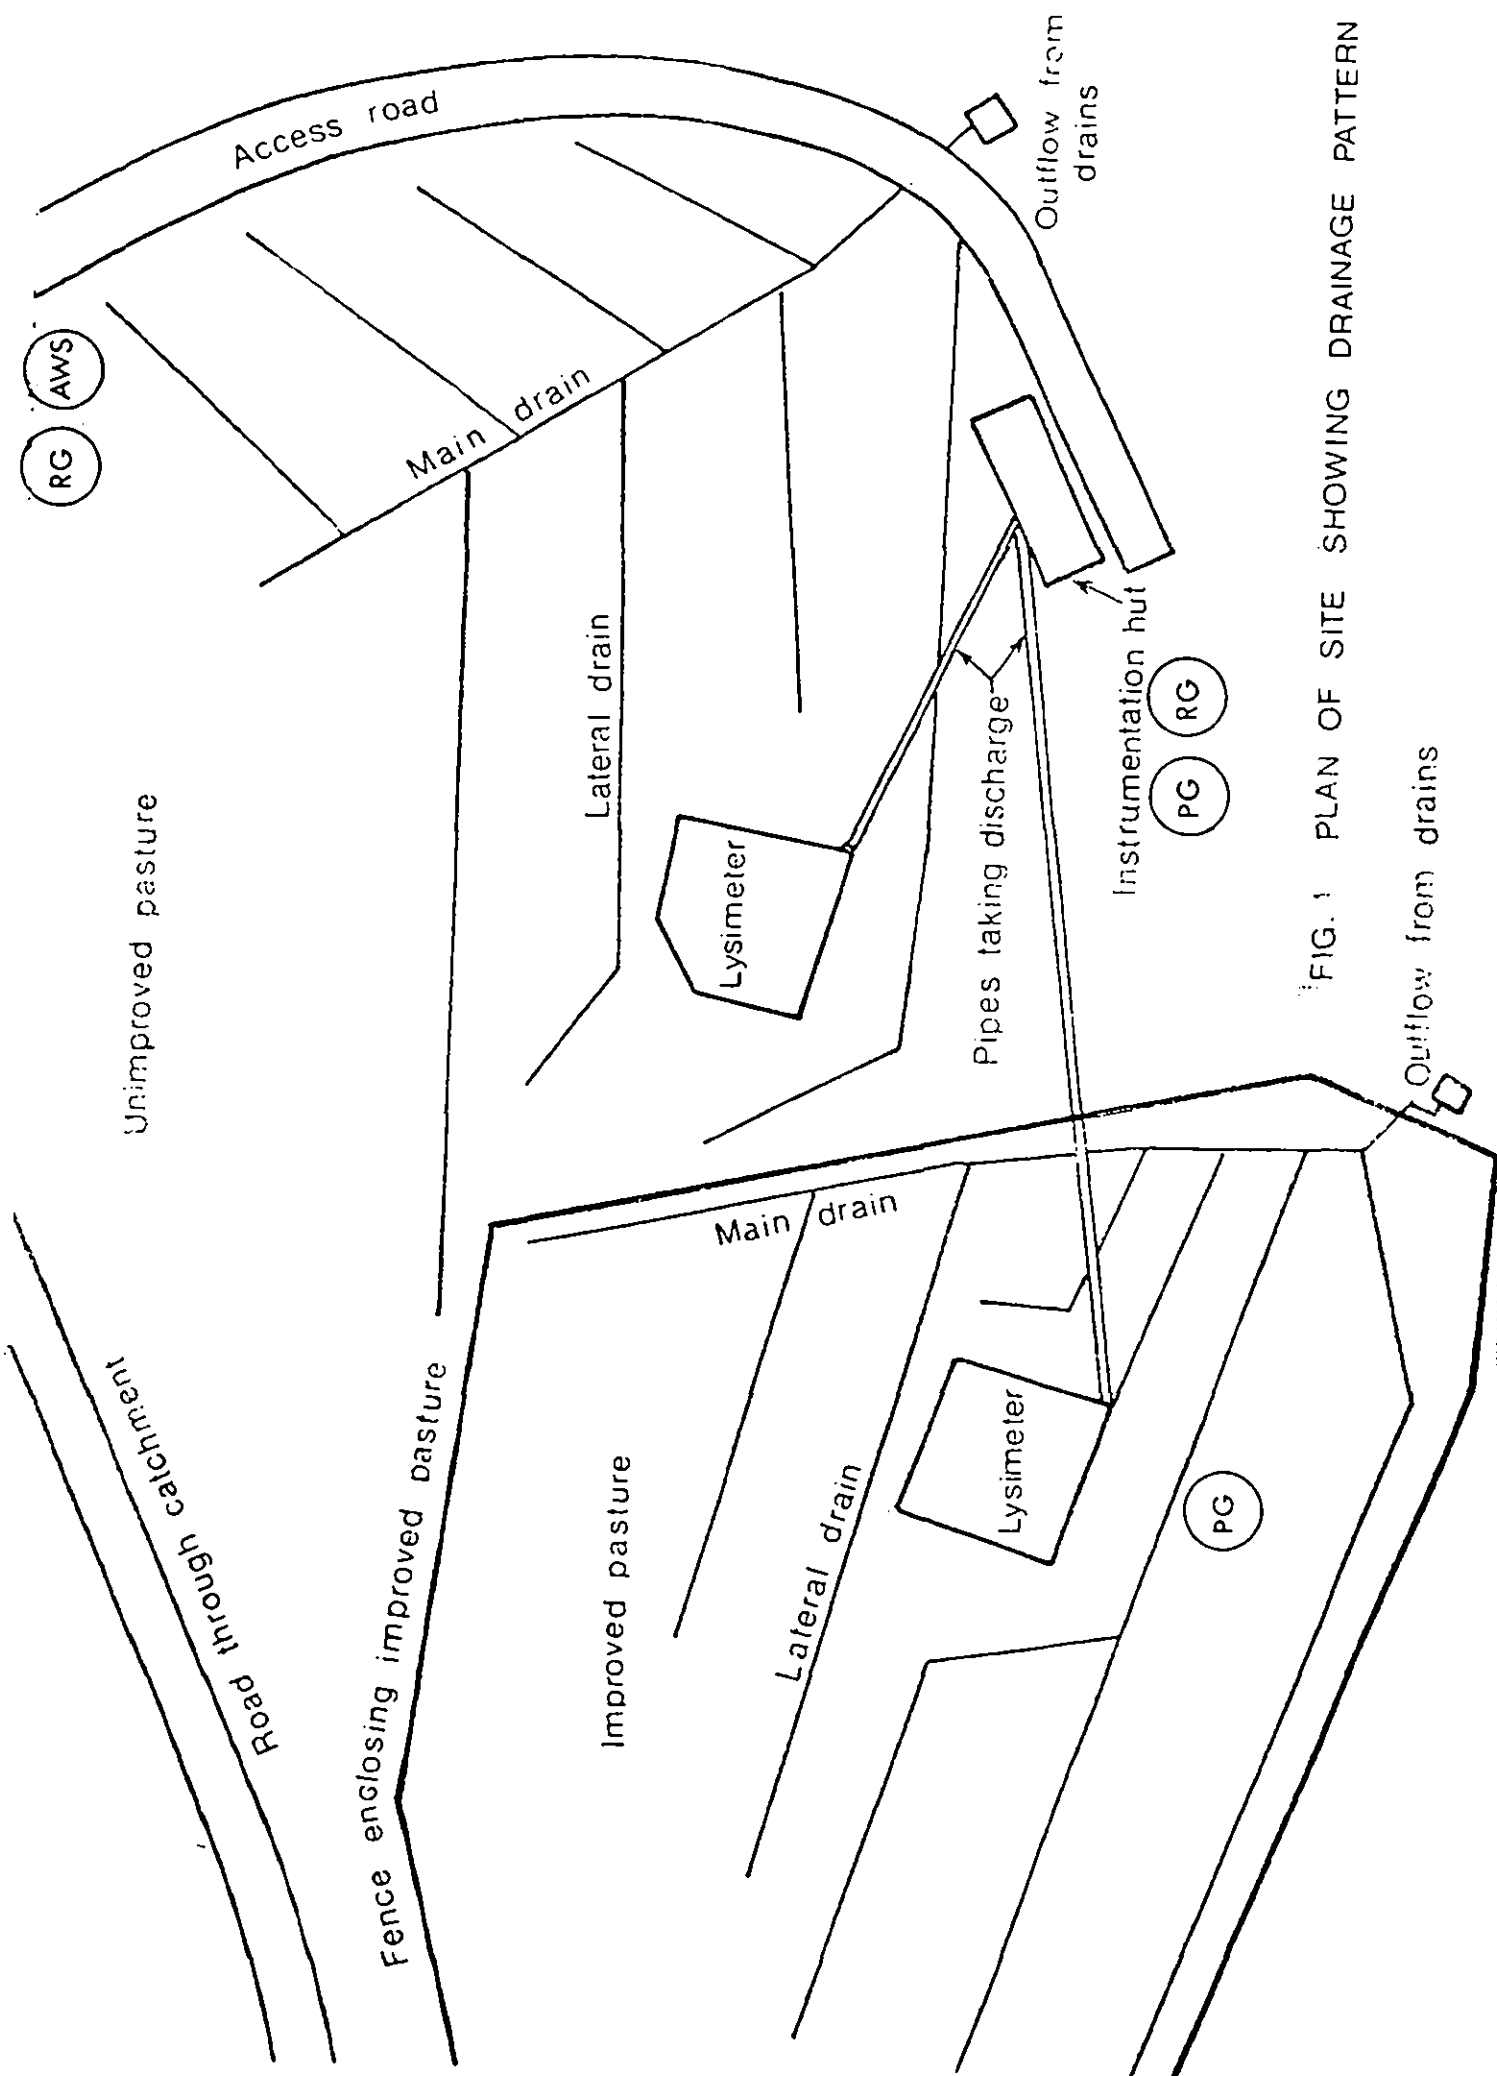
PLAN OF SITE SHOWING DRAINAGE PATTERN
